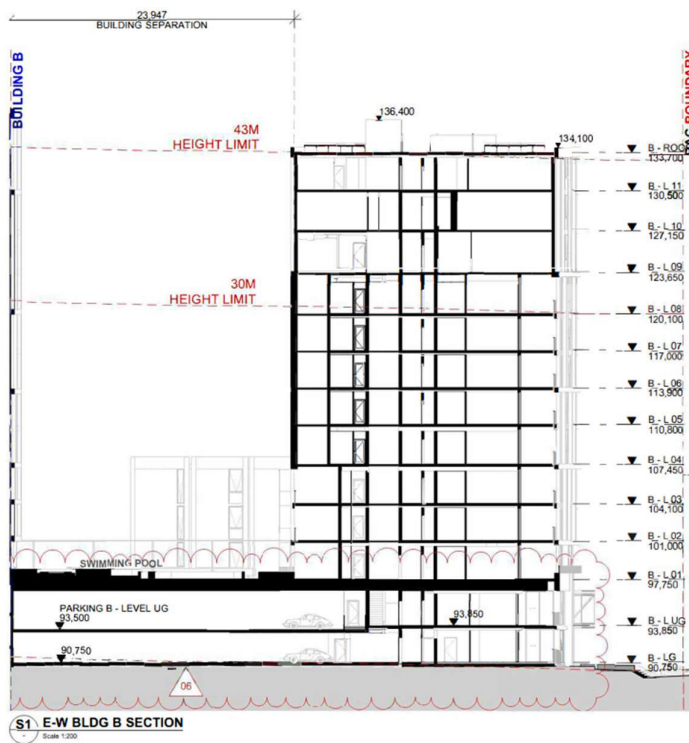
Approved and Proposed E-W Section of Building B (1 of 2)
